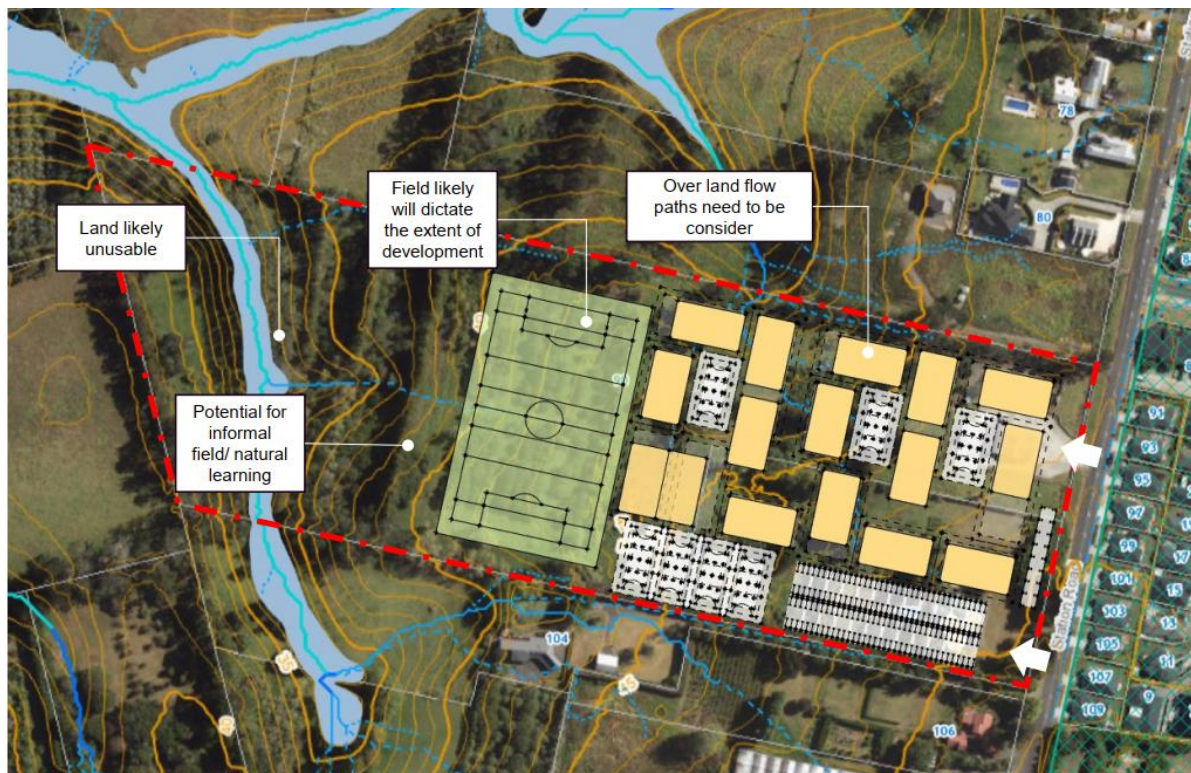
Site 16/16A layout (Source: The Ministry's School Property Standard Planning Team)
